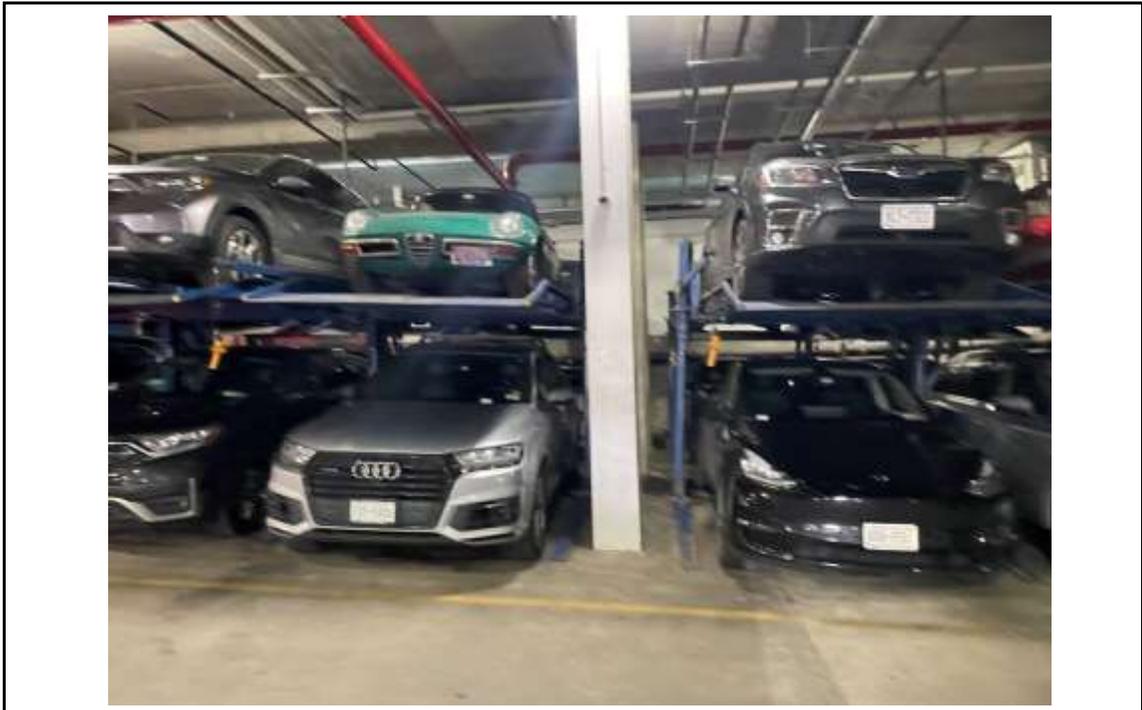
Subgrade parking garage concrete slab, facing northwest. 02 March 2023.
